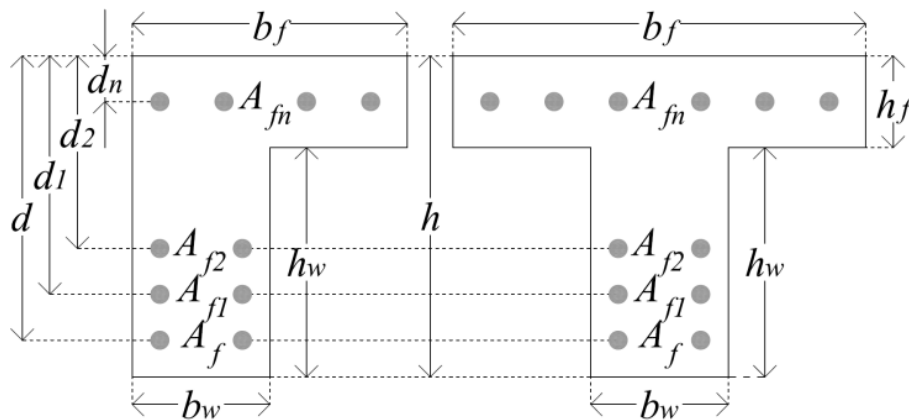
T and L beam cross-sections reinforced with $n + 1$ layers of FRP bars
